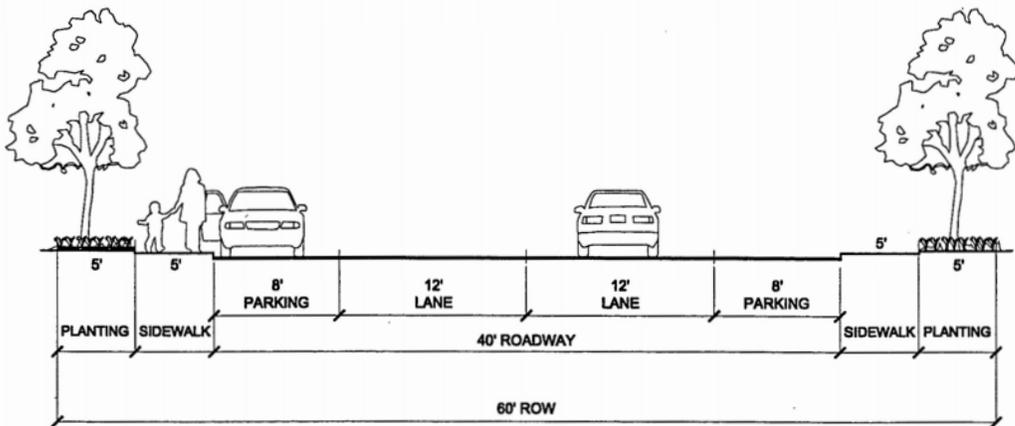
Recommended Minimum Arterial Roadway Standards
